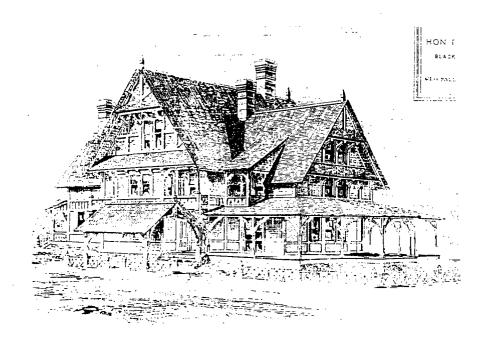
George Palliser, P. T. Barnum House, Black Rock Beach, Conn. (American Architect, 1876).
